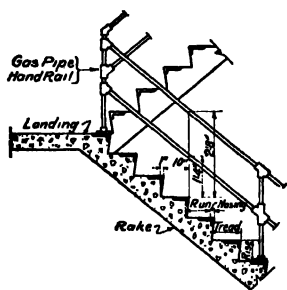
Diagram showing rise, run, tread, etc. of stair.
